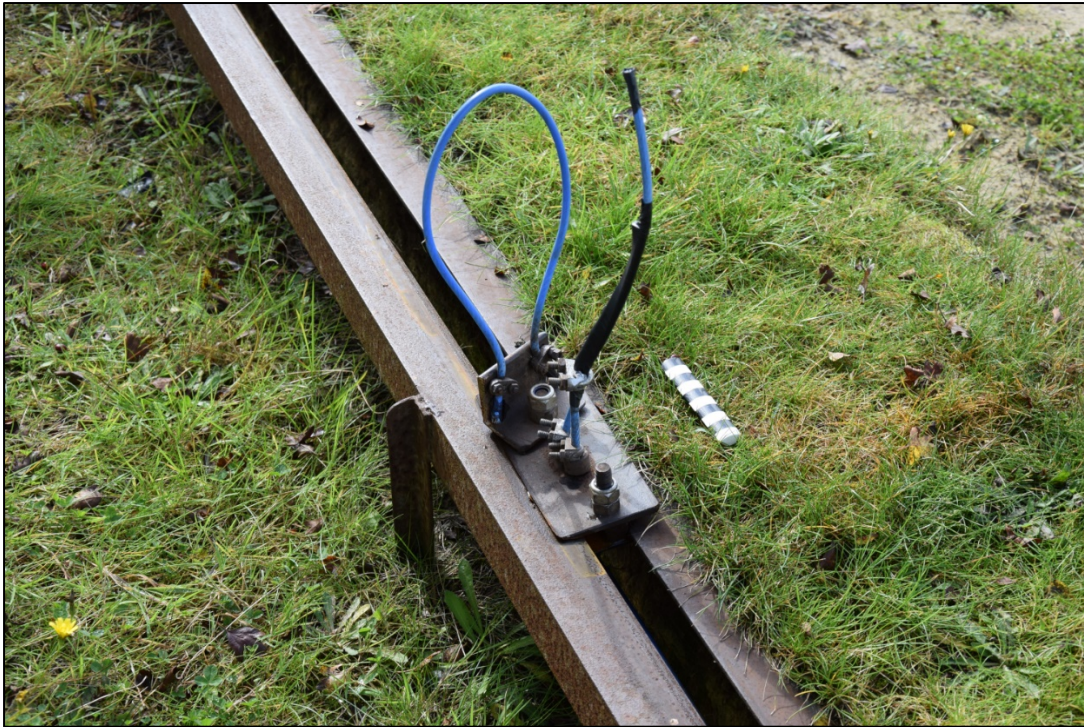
Detail of the hare track showing a typical welded joint between straight sections and evidence of wear. The blue cable (centre) draws the hare along
